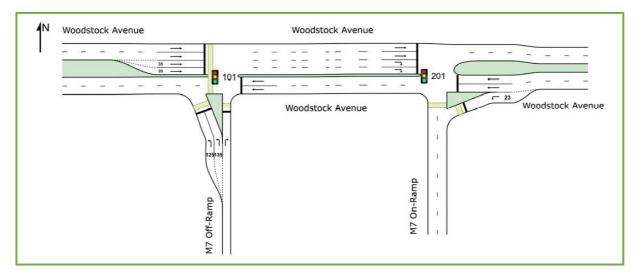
Network layout of the intersection of the M7 on/off ramps and Woodstock Avenue
